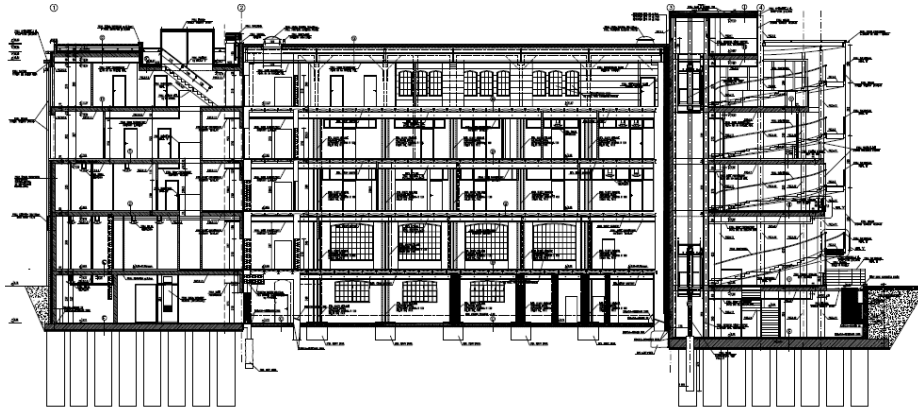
Distribution of jet grouting piles under part A and B (cross section)
